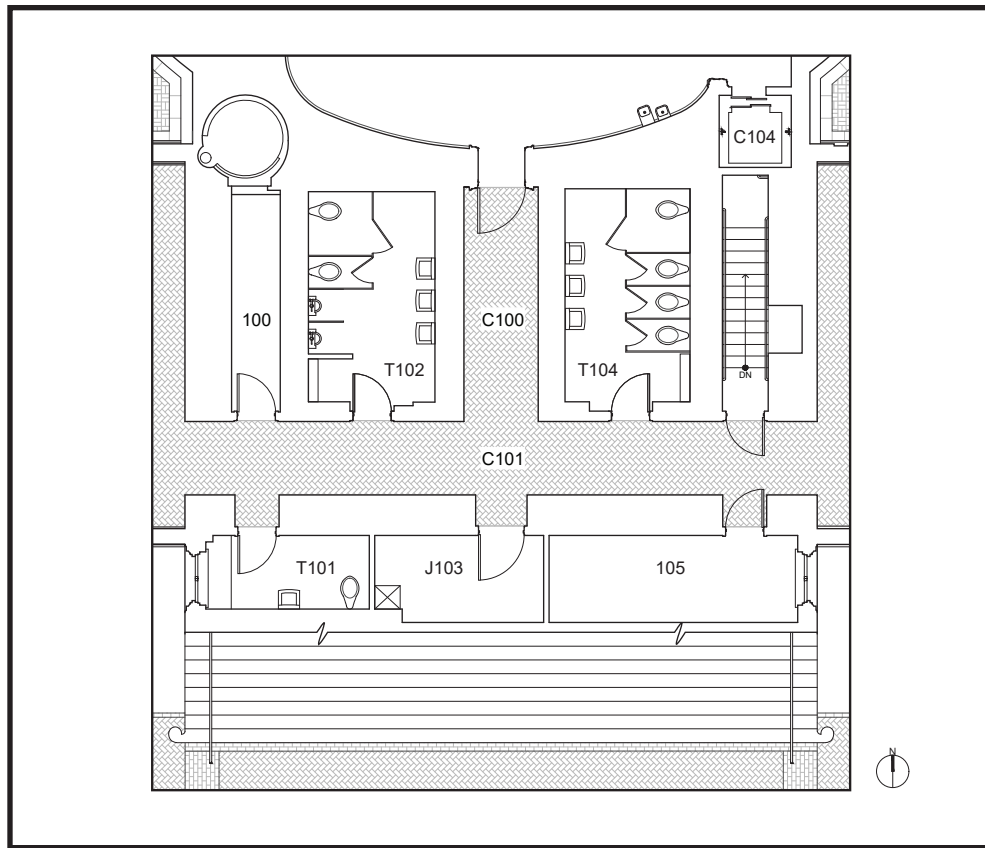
Detail, ground-floor plan of the rooms below the south portico (cryptoporticus) (not to scale).
